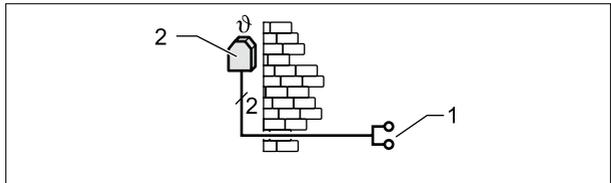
Radio-controlled clock module with outside sensor (accessories) - connecting
